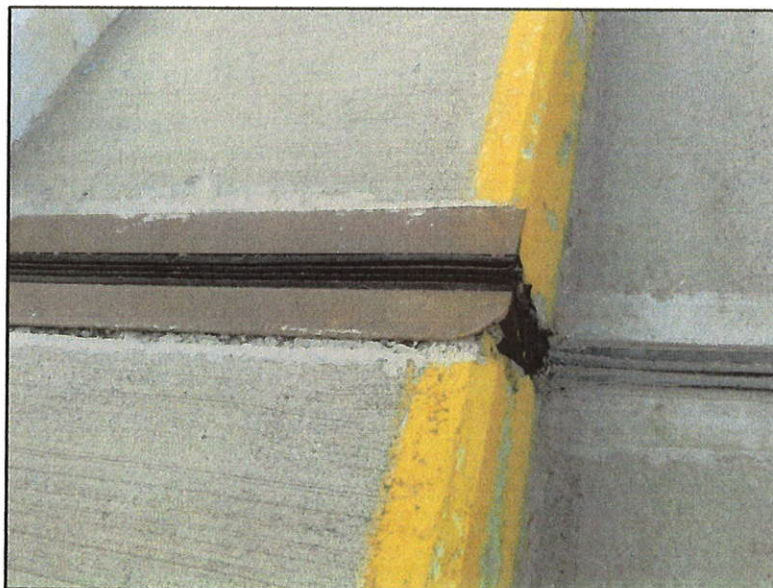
D shows an example of cracking and spalling in the sidewalk. This damage is located at the span 1 southbound sidewalk.
